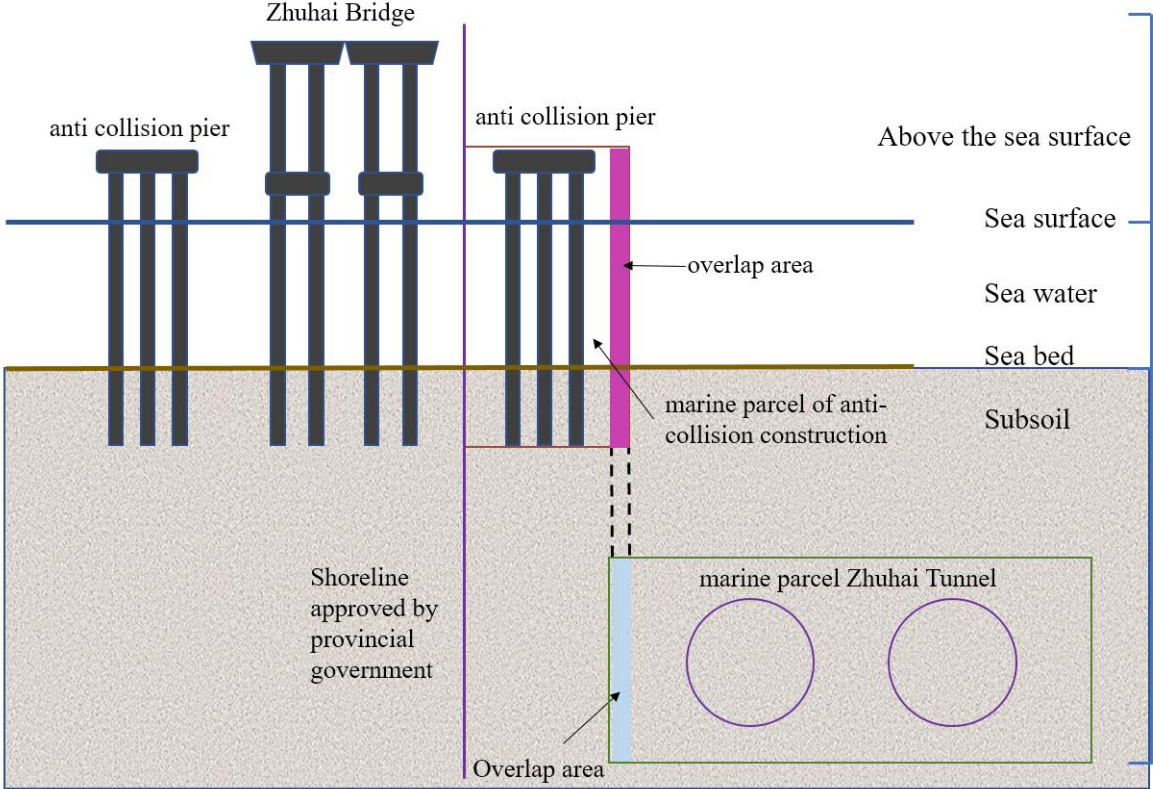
Cross section of Zhuhai Tunnel and Zhuhai Bridge anti-collision construction project
